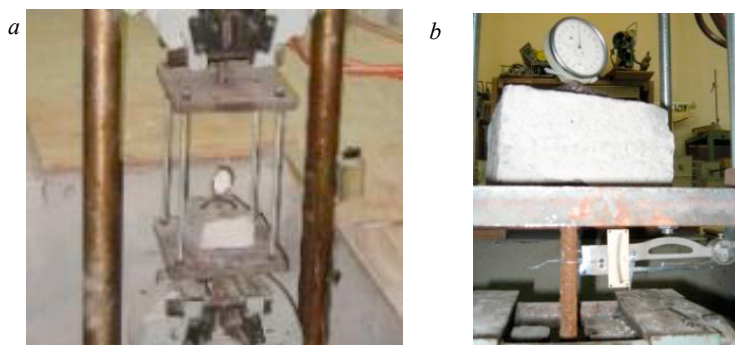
General view of specimen testing in the hydraulic tensile machine (a) and measurement of reinforcement displacement using a dial gauge and bar deformation using a Huggenberger extensometer (b).
